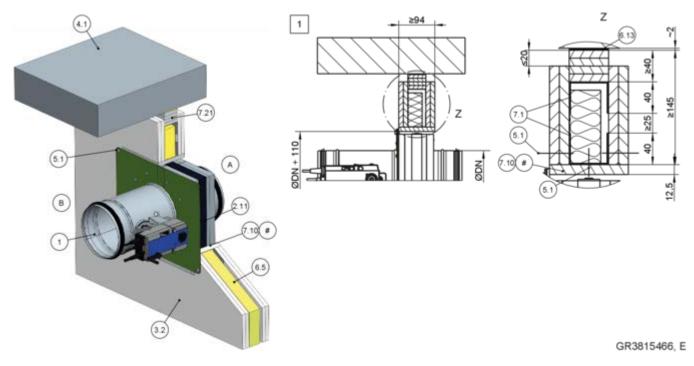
Dry mortarless installation with installation kit TQ2 into a lightweight partition wall, below a flexible ceiling joint
